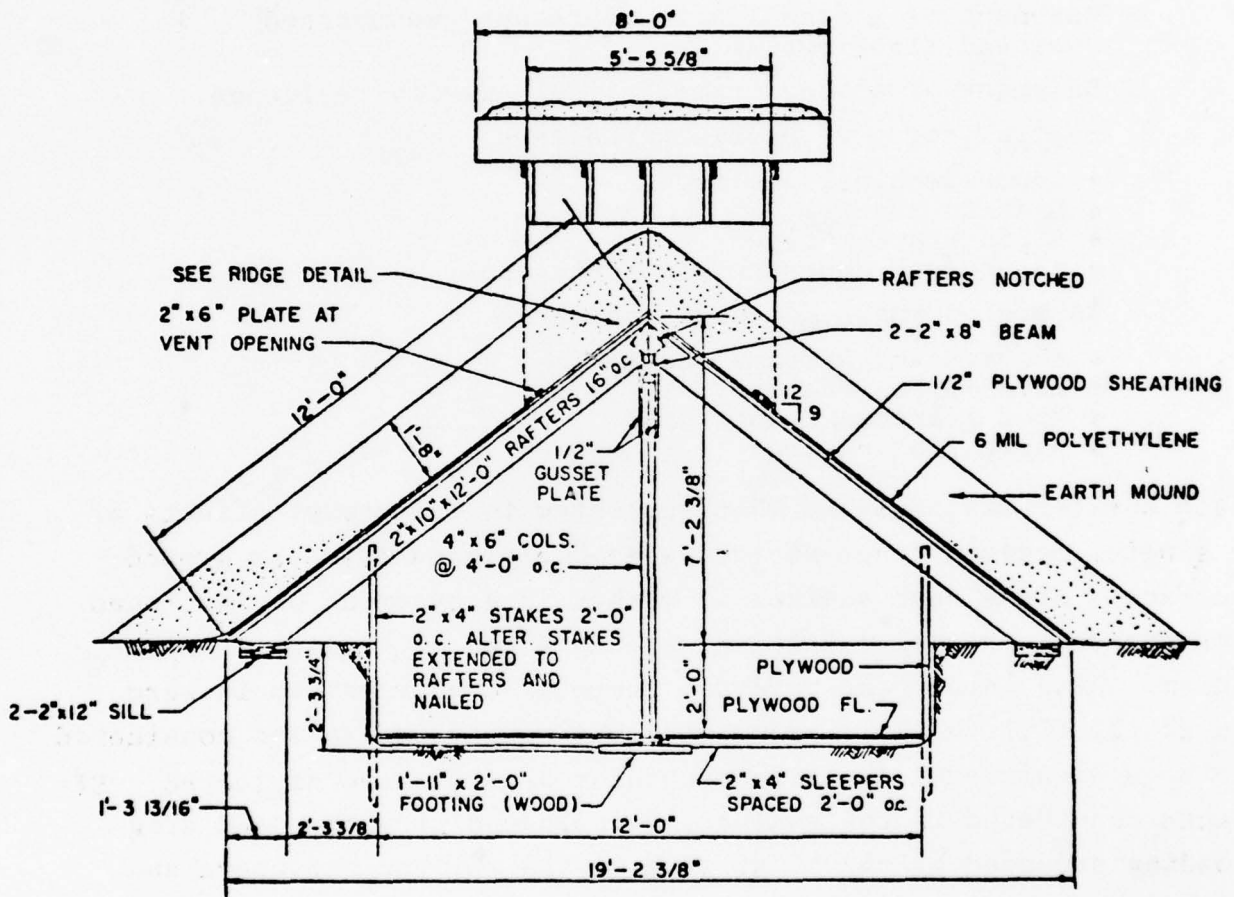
Shelter H, Gable Roof Shelter (Section B-B)
